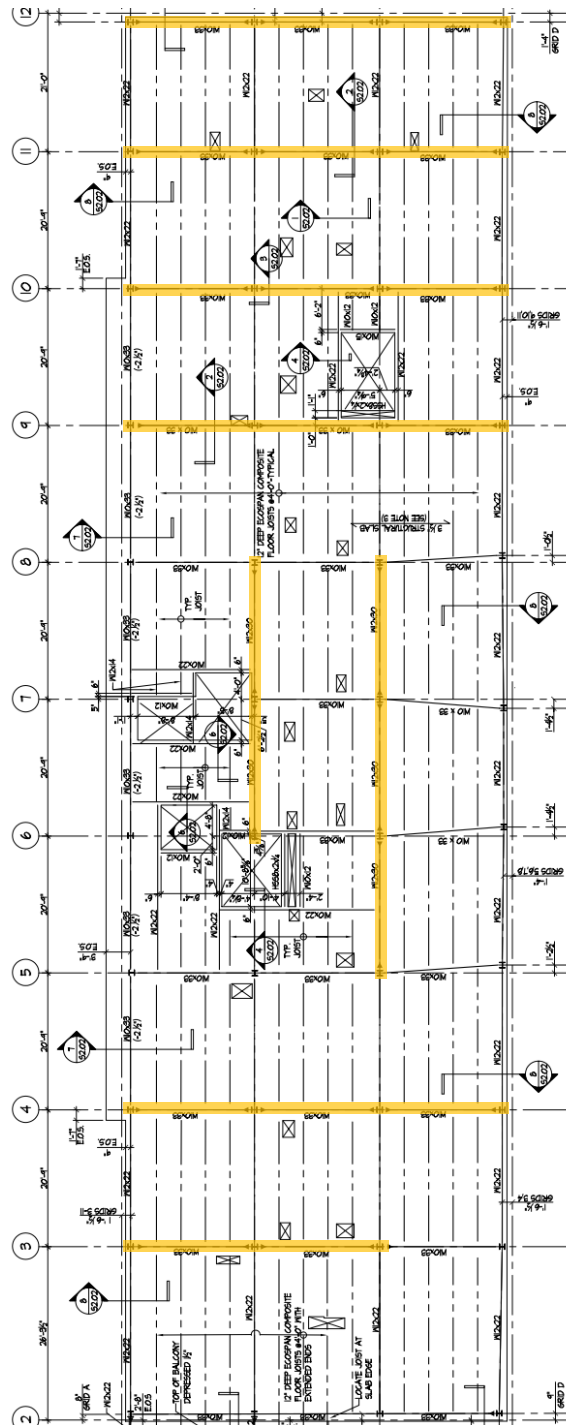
Typical Floor Plan, moment frames shown highlighted, S1.07
